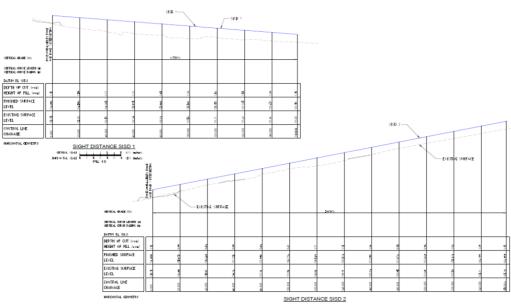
New Road (1) / Rosewood Laidley Road Intersection Sight Line Elevation Assessment
